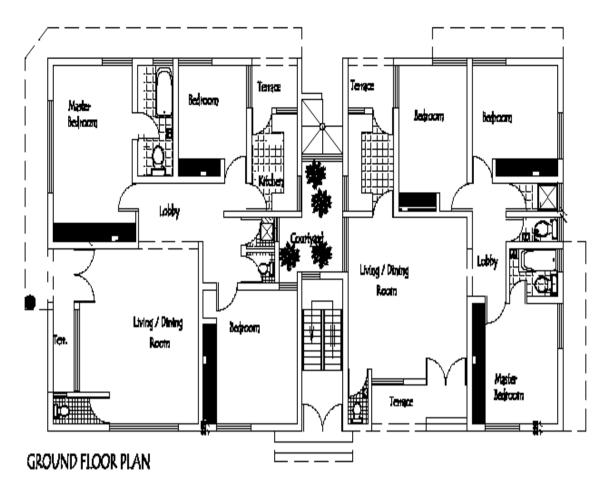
Ground Floor Plan of a Typical Block of Flat
